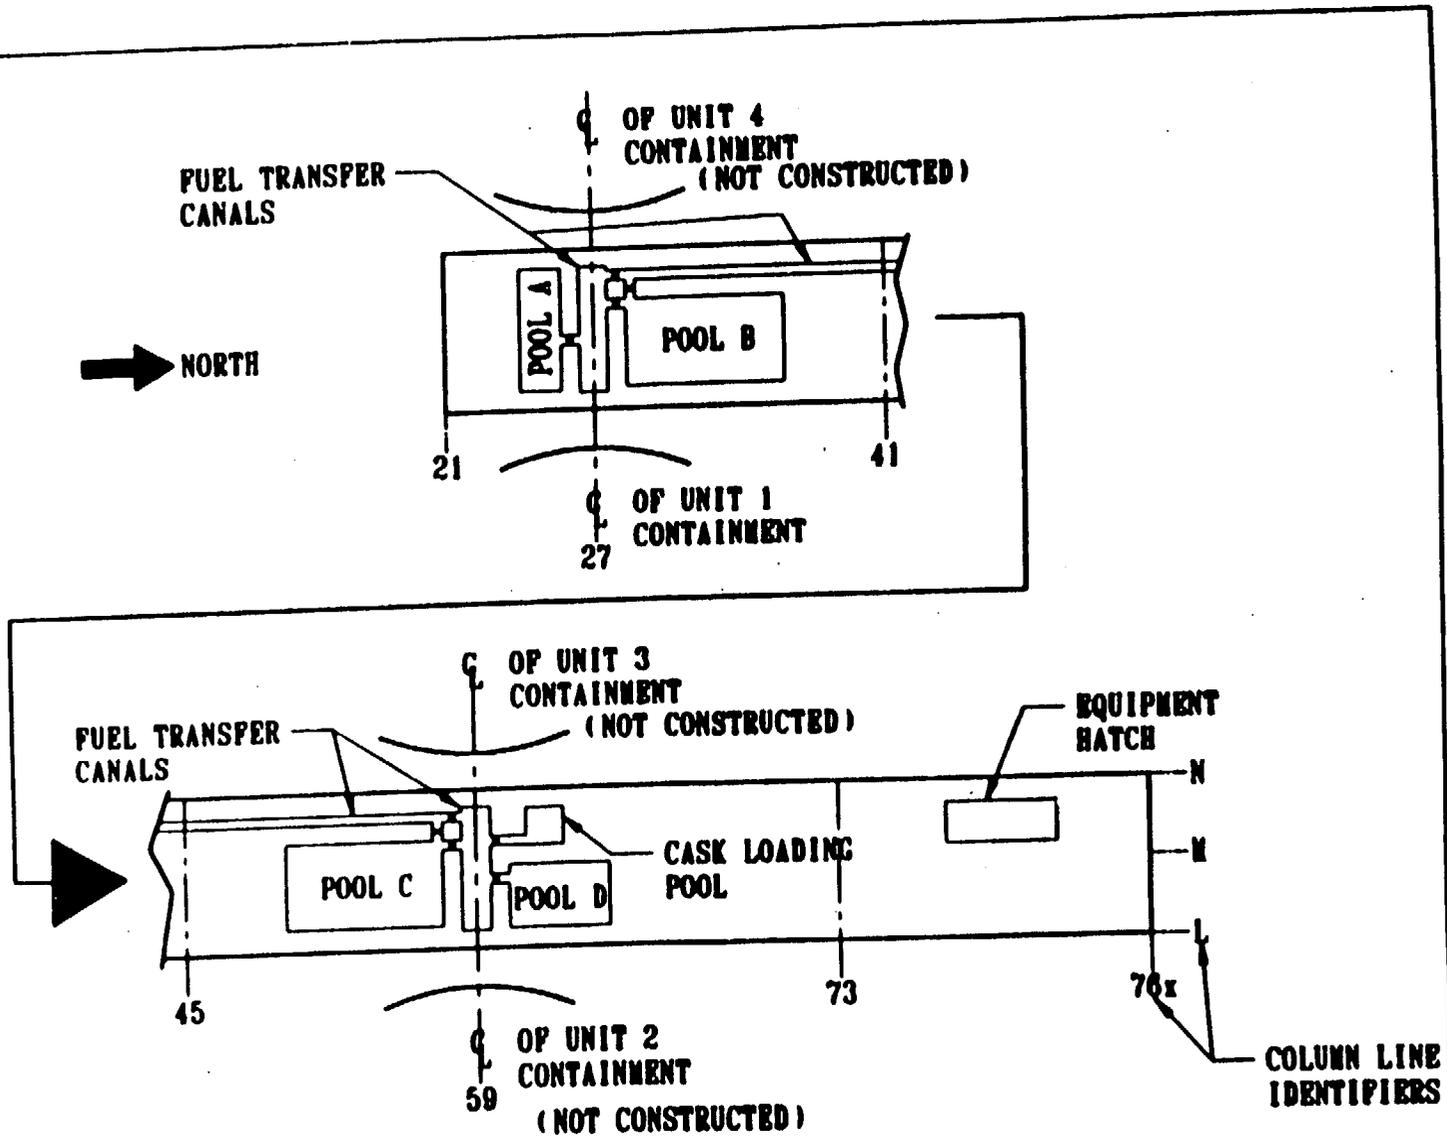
; HARRIS FUEL HANDLING BUILDING PLAN LAYOUT
